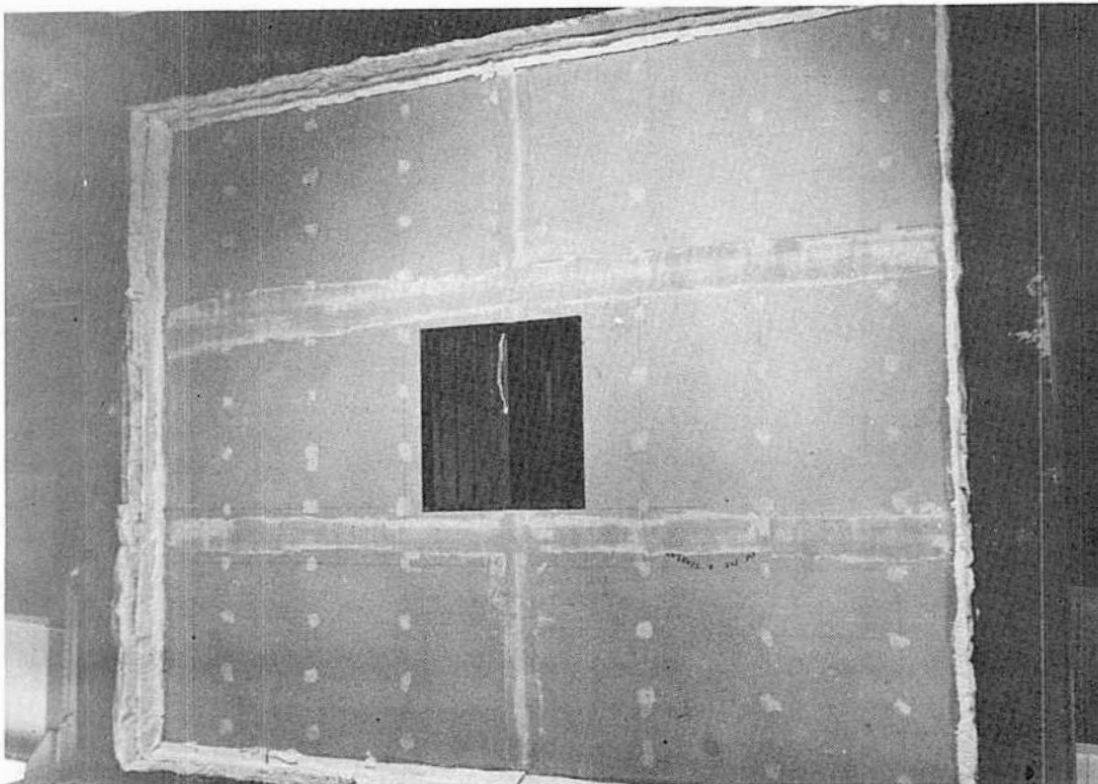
COMPLETED CEILING (ASSEMBLY NO. 2)
